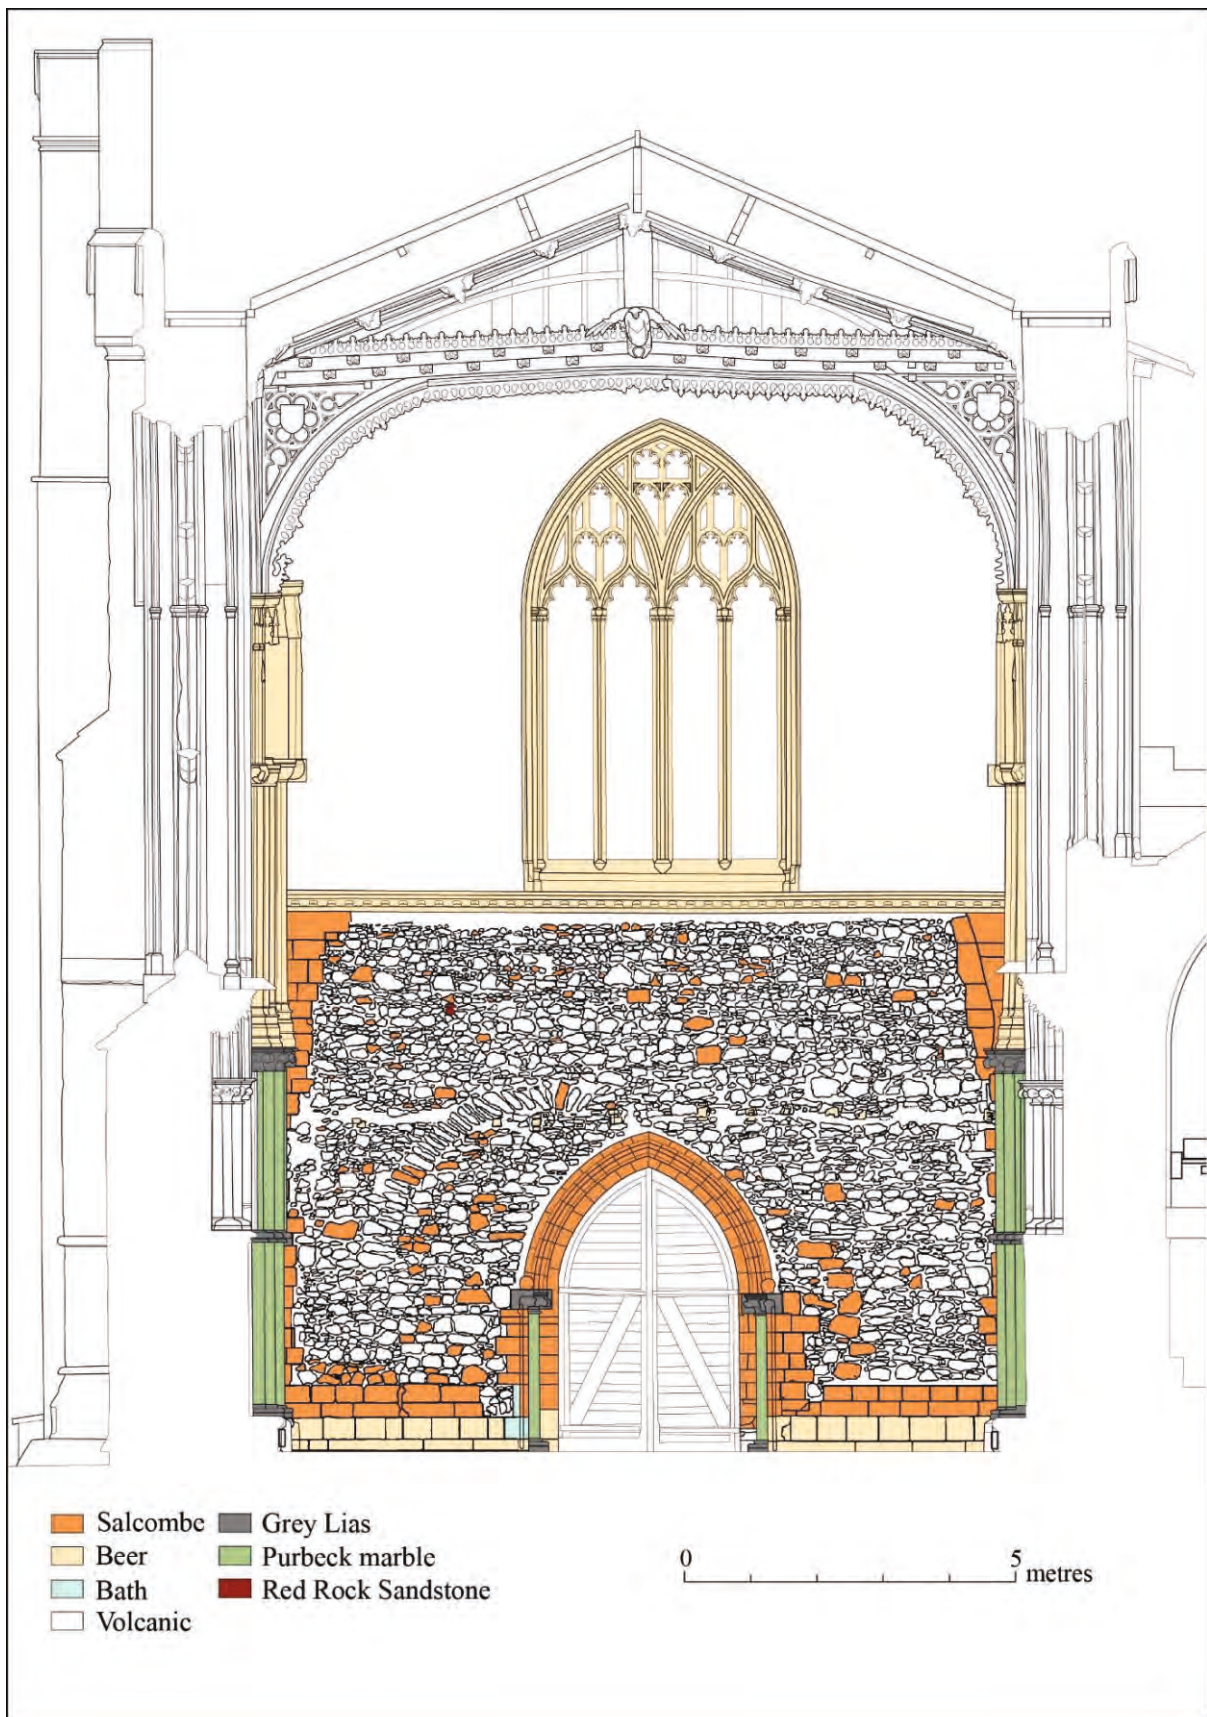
The Chapter House, internal face of the west wall: geology (*J. Allan & J. Sampson 1996, with new survey, Downland 2020, and corrections/additions, J. Allan 2021*).
